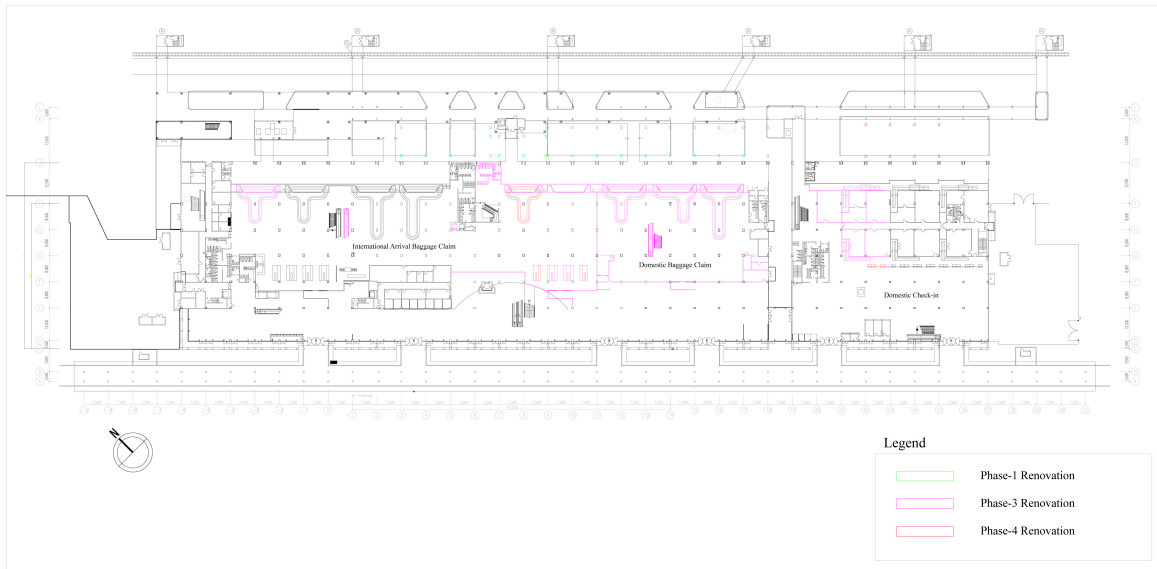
Phase-4 Renovation Plan of Passenger Terminal Building (1st Floor)
